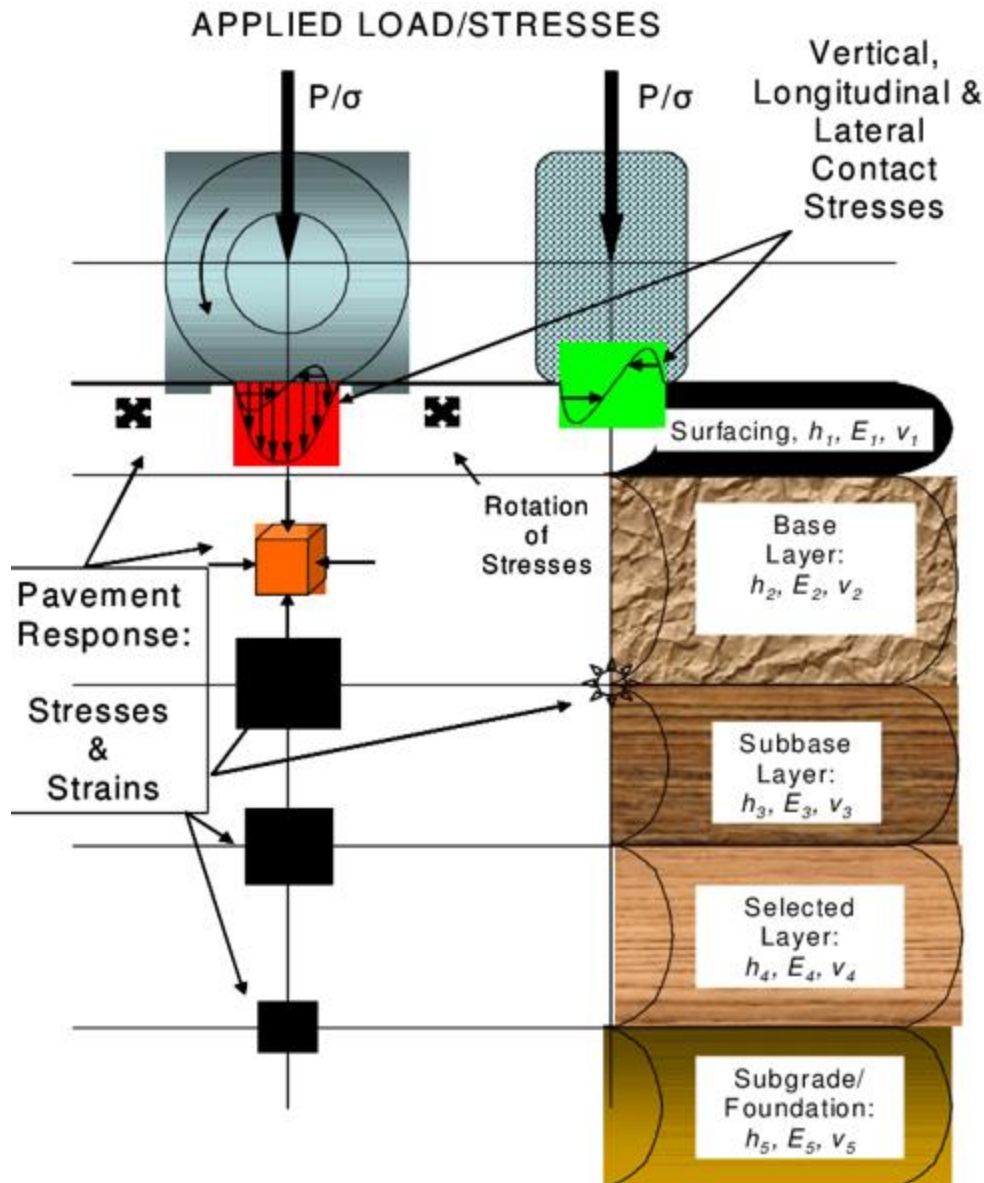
Basic Layout for Multilayers in Flexible Pavement system
